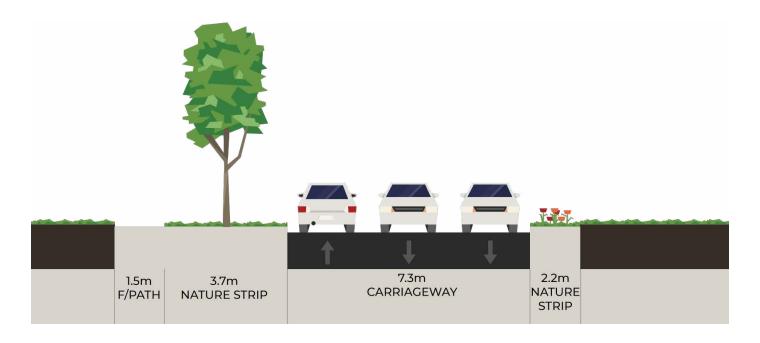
Internal Access Street Cross Section – Local Access Street Level 1 (14m)
